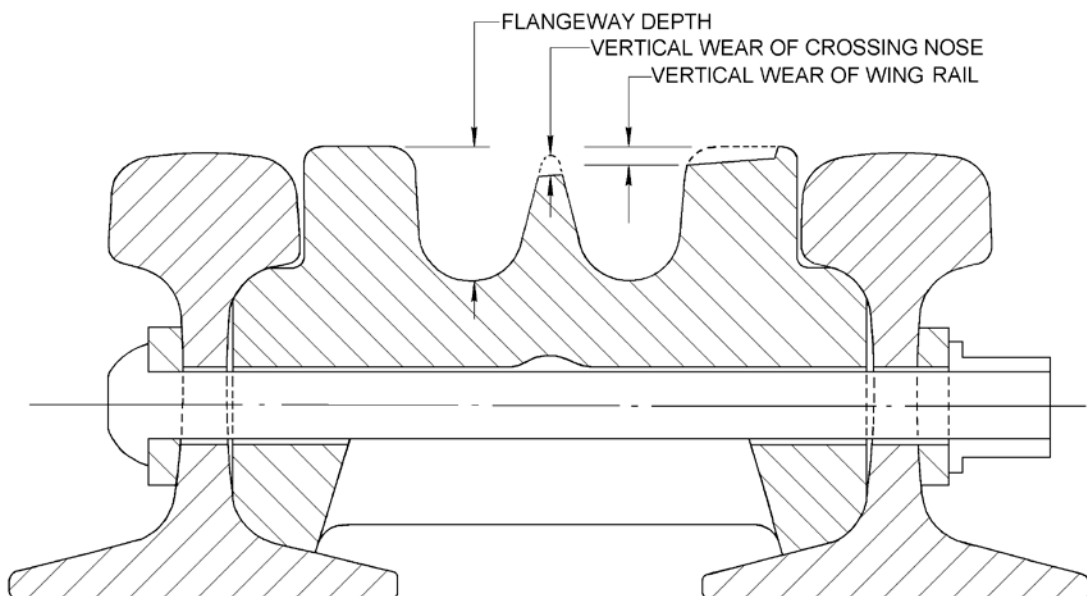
Rail bound manganese crossing - detail of worn or broken crossing nose- Note: Details of vertical wear of nose and wing rail are similar to those shown for fabricated crossing in figure 4.9; longitudinal section through nose and plan view of crossing are similar to those shown in figure 4.10
